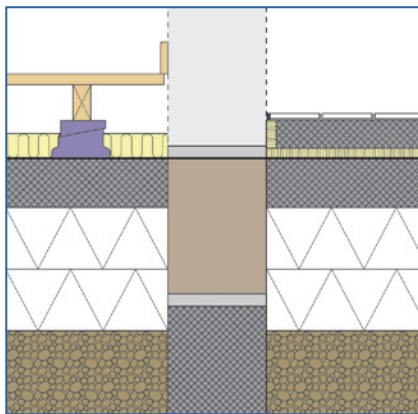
Example of Danish heavy solid wall construction for new terraced housing fulfilling the Danish Building Regulations 2010. From [7], where more information about materials and dimensions can be found.
